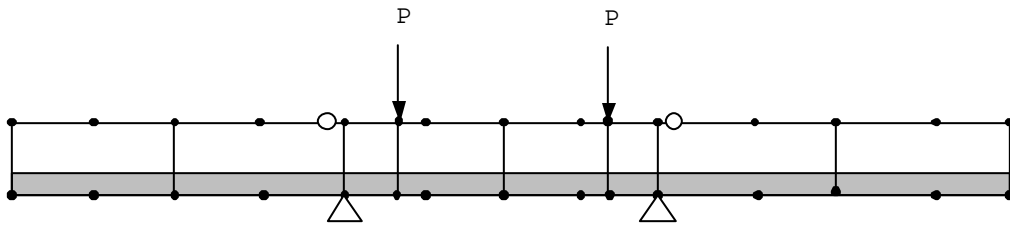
Illustration of 3-Span Bridge Chord, Rods are Frame Elements, 2-Point Load Beam Model
